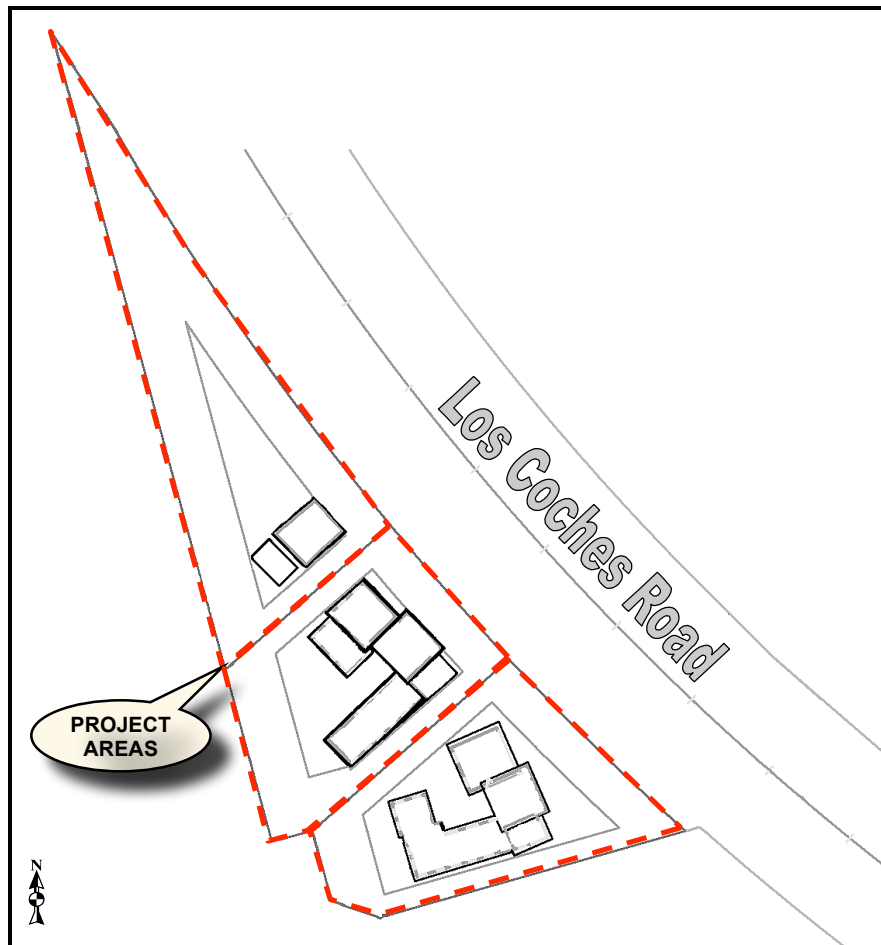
Proposed Site Plan – TPM 21030 (Martin and Ziemanak Engineering 2/07)
